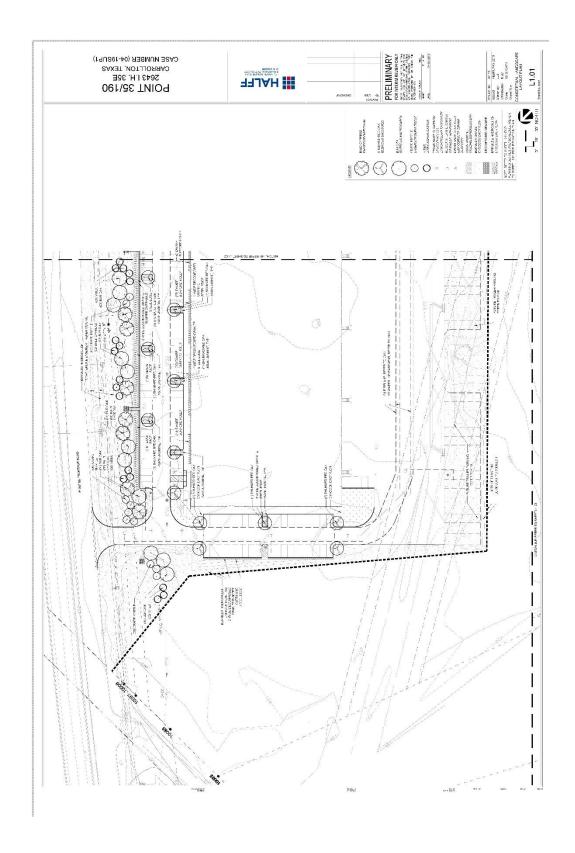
EXHIBIT D CONCEPTUAL LANDSCAPE PLAN
